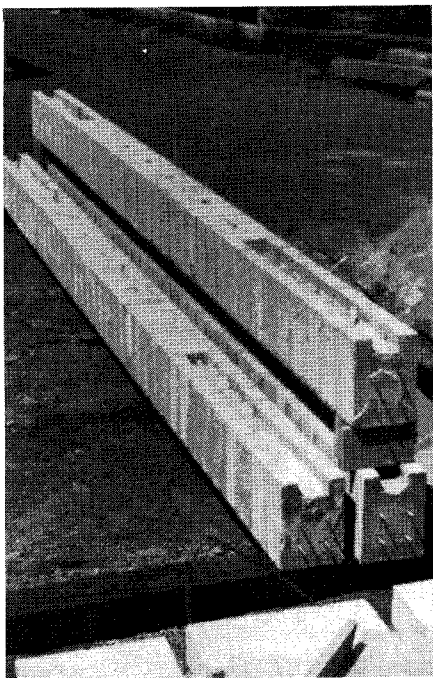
12 x 16-in. (305 x 406 mm) building beams with grouted strands. Note slot for continuity steel in 12 x 16-in. (305 x 406 mm) block.
